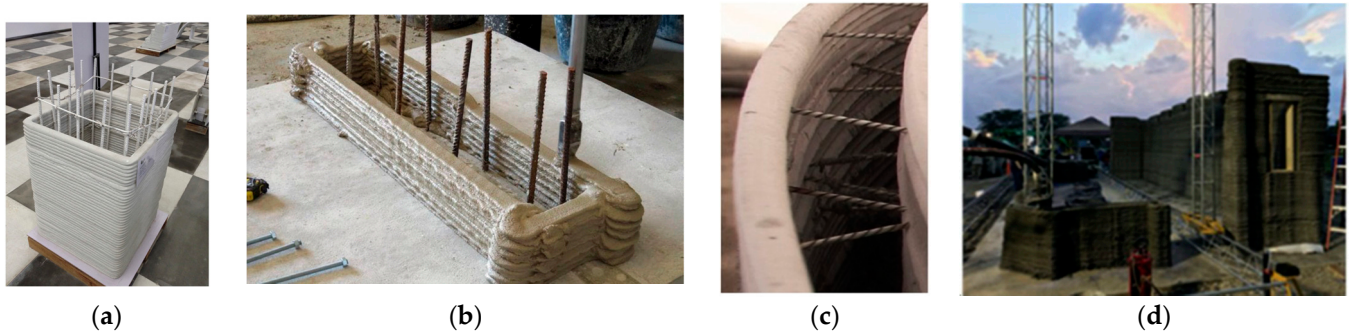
Reinforcement methods for printed concrete adopted by (a) WinSun [29], (b) CyBe [57], and (c) Apis Cor [58]. (d) Printed concrete building construction [56].
